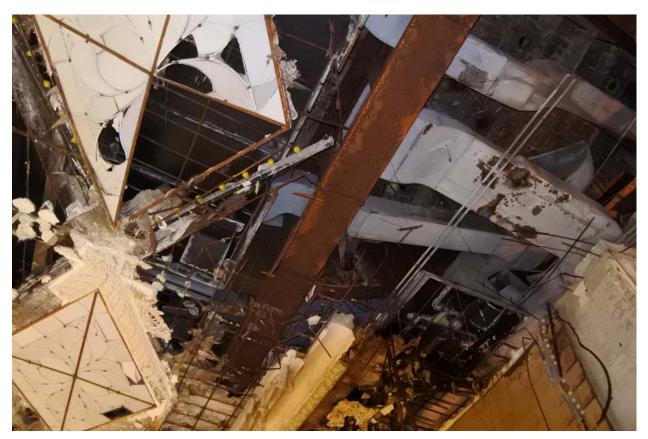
Underside of balcony has heavy plate girder supporting built-up steel "raker" beams that appear to have only surface rust where they are exposed. Less than half of the balcony framing could be observed due to some ceiling finishes still being in place.
